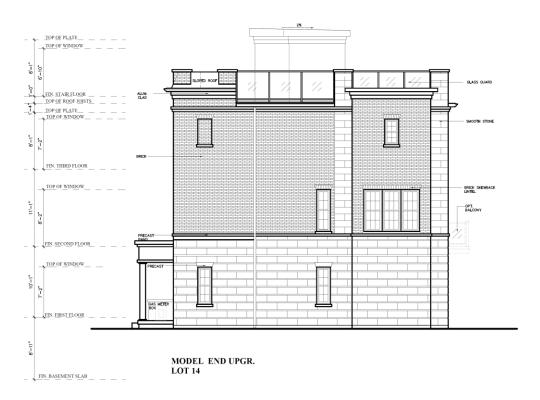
Block 4 Right Side Elevation, Sheet A4 (FBP Architects Inc., September 1, 2023)
